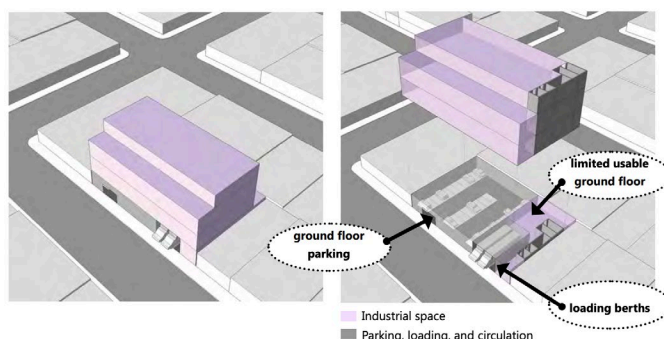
A diagram from the North Brooklyn Industry and Innovation Plan that depicts how current parking and loading requirements constrain the amount of usable ground floor area on smaller industrial sites.
